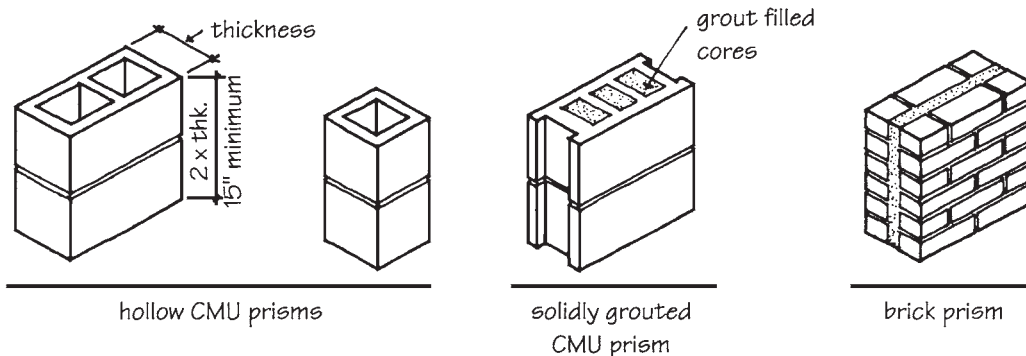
ASTM C1314 test prisms for masonry assemblages of units, mortar, and grout.
